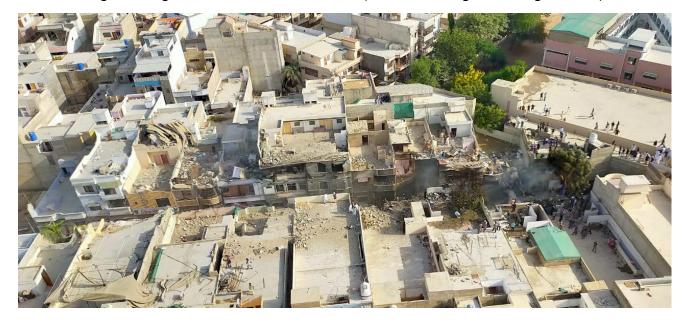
Arial view of the crash site street (direction of flight from left to right)
